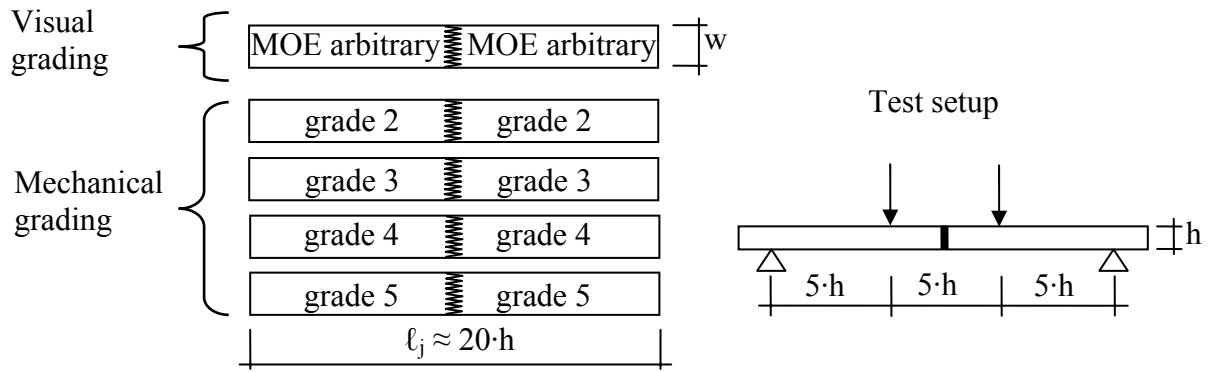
Finger joint specimen manufacture (left) and test setup (right)
